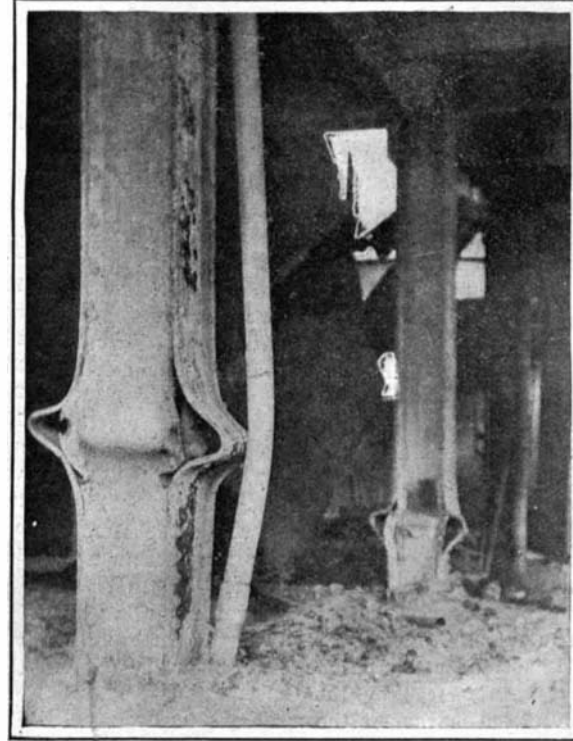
Non-Fireproofed Columns in Monadnock Building, Buckled and Shortened 10 Inches.
